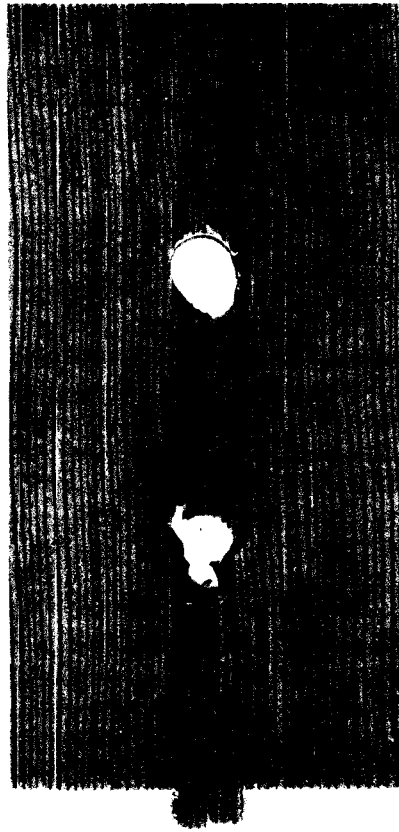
Photograph of failure of three-member double-bolted mechanical fastener in Douglas-fir (a = 2 in., b = 1.5 in., c = 2 in., R = 0.25 in., r/R = 0.924, t = 0.5 in.,  $P_A/P_B = 50/50$ ).
